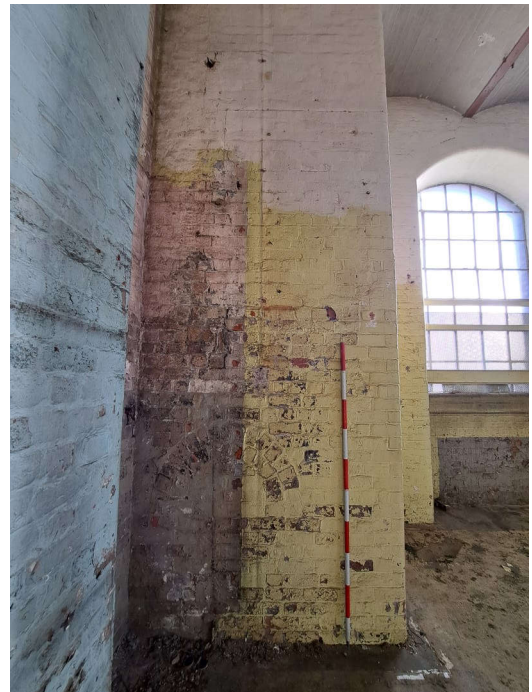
Detail of blocked opening in north-east chimney in room T.1. 1 x 2m scale
